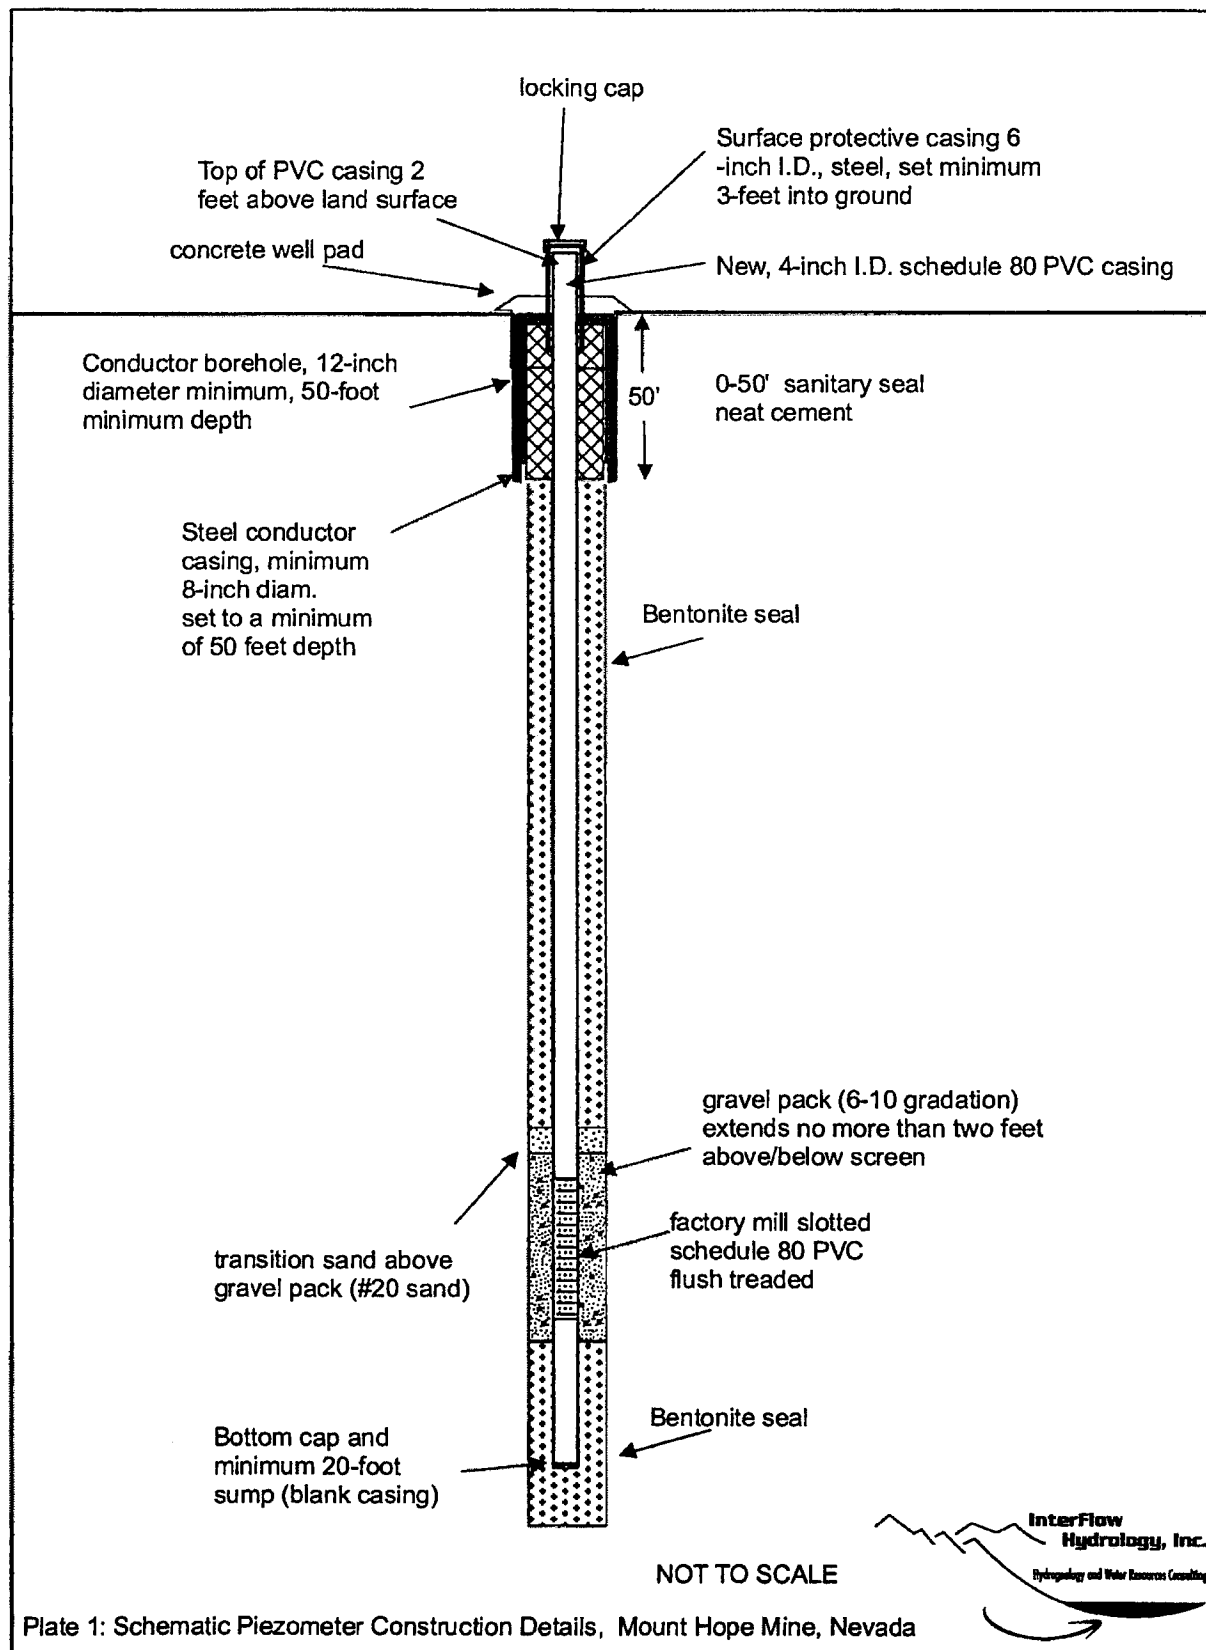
Schematic Piezometer Construction Details, Mount Hope Mine, Nevada
